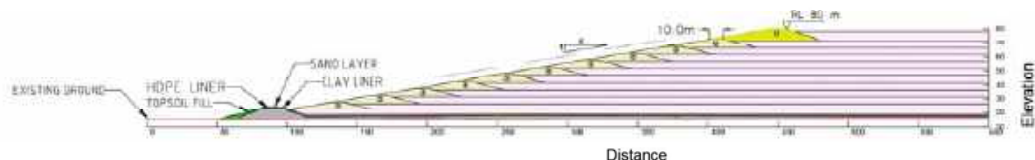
Typical Section of New West and North Wall (Drawing No. WG005481)
